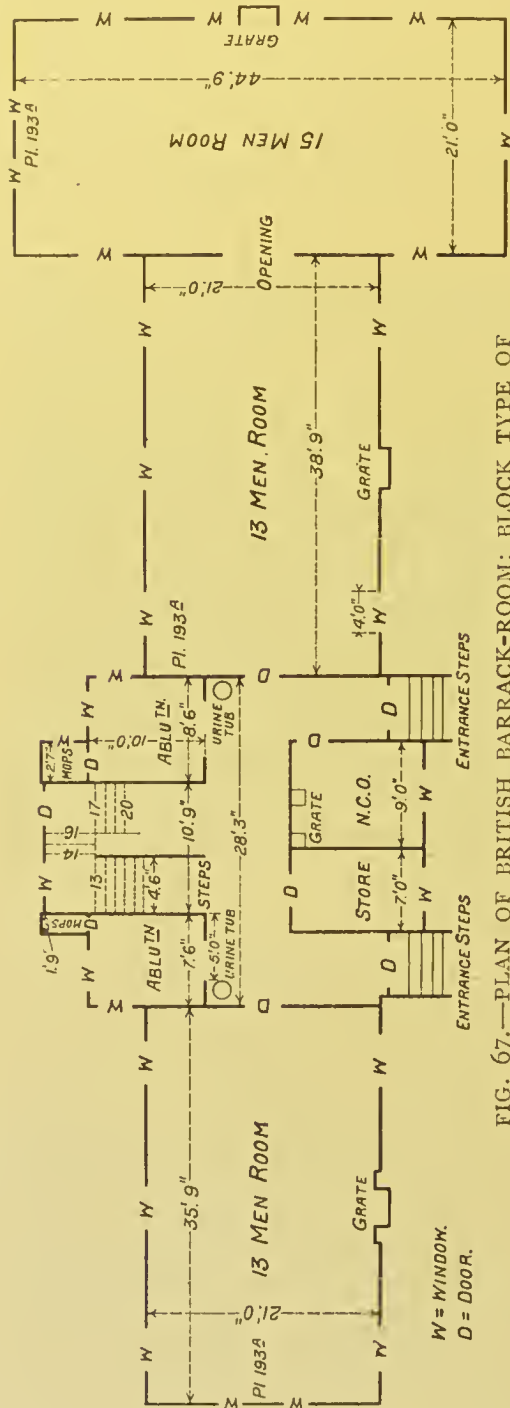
PLAN OF BRITISH BARRACK-ROOM: BLOCK TYPE OF BARRACKS.
